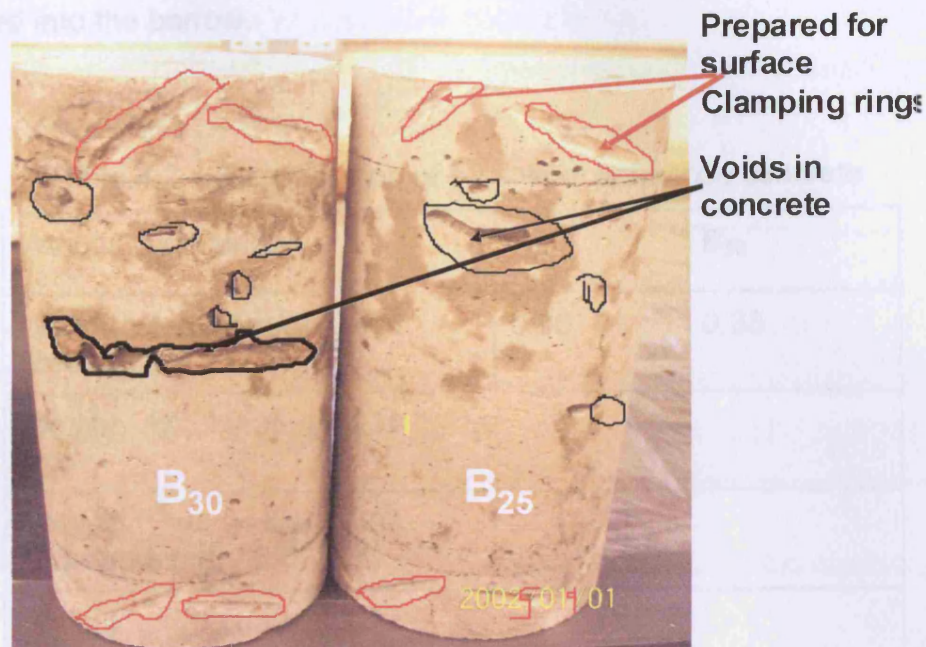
Cylinder specimens of Rock wool enhanced concrete.
